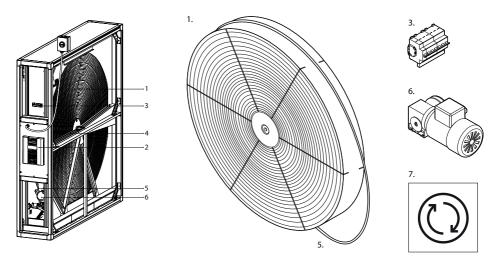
Rotary heat exchanger section 1 – rotor wheel, 2 – automation box, 3 – automatic switch, 4 – rotor wheel brush seals, 5 – rotor belt, 6 – rotor gear motor, 7 – rotor section label
